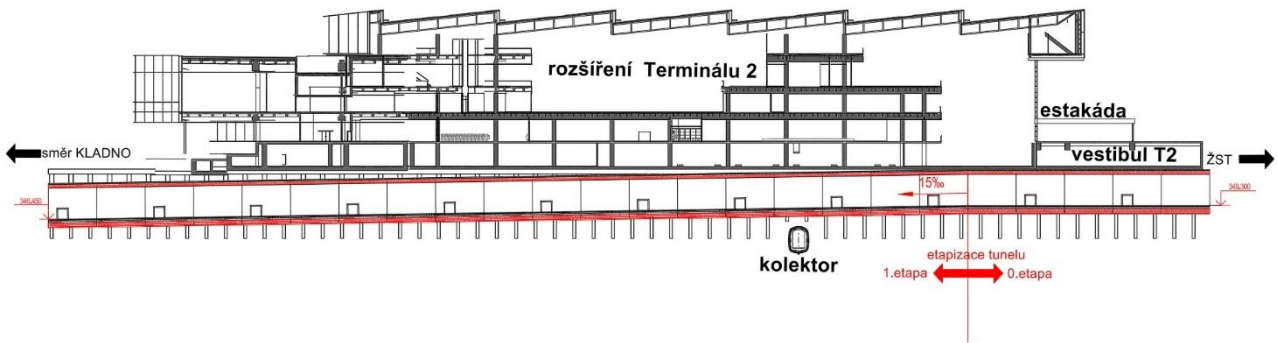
Longitudinal section of the tunnel tube at the site below the future terminal extension
